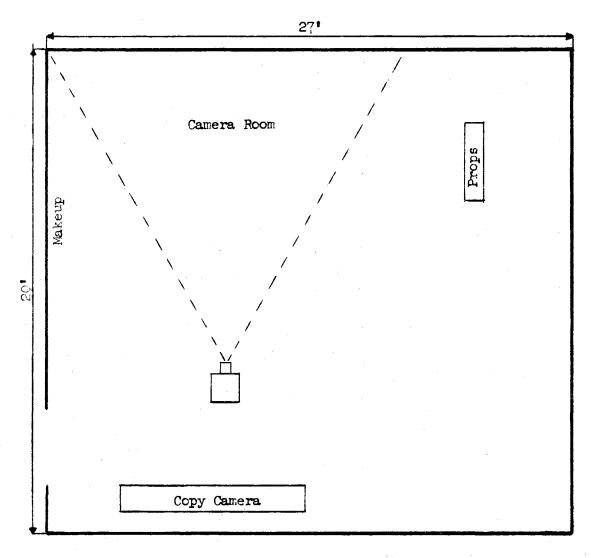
CAMERA ROOM FLOOR PLAN - DAILY OKLAHOMAN - TIMES. (SCALE 1/4" = 1")
